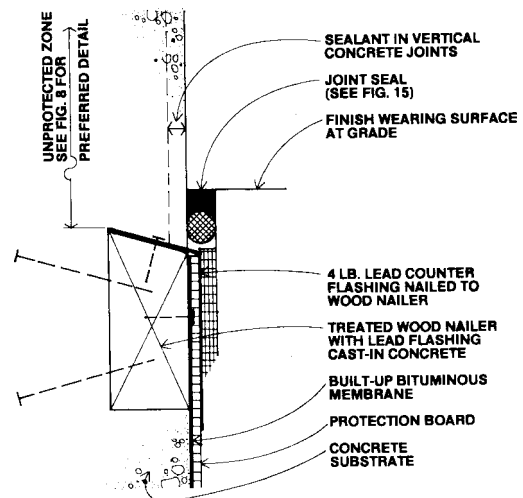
Terminal Conditions on Concrete Wall Below Finish Wearing Surface at Grade (see 9.8.8 and 9.8.8.2)
